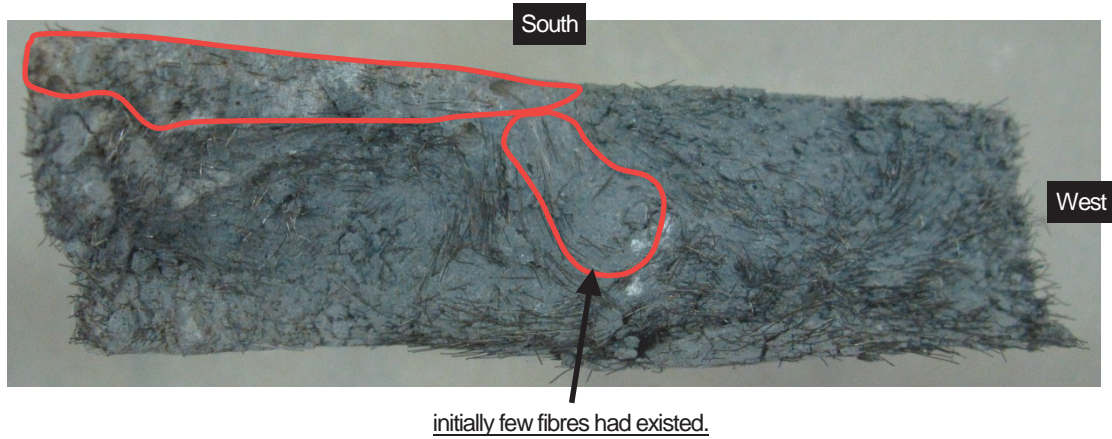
Fatigue fracture surface of S3-4 test specimen (lower half of the fractured specimen)
